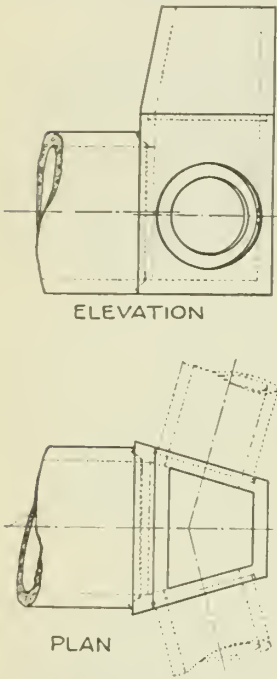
Outlet at End of Outfall Showing Branch Pipes.
